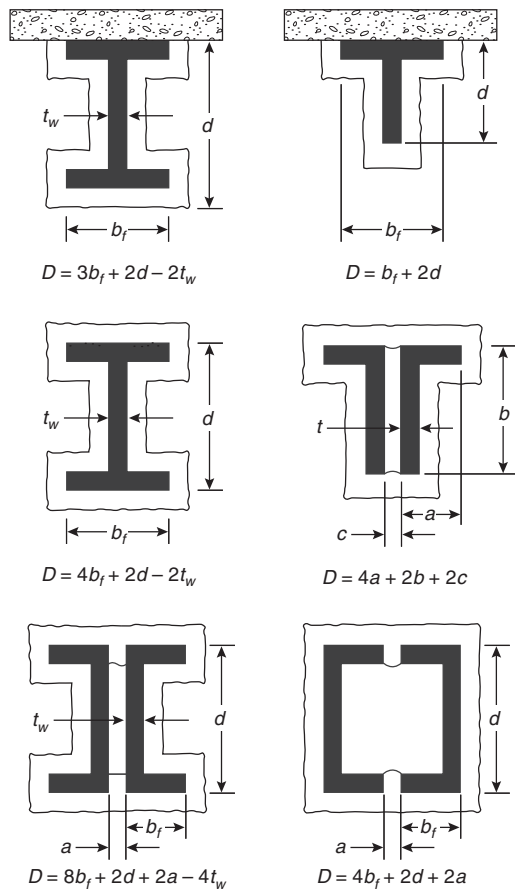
Heated perimeter for steel truss shapes.³³
